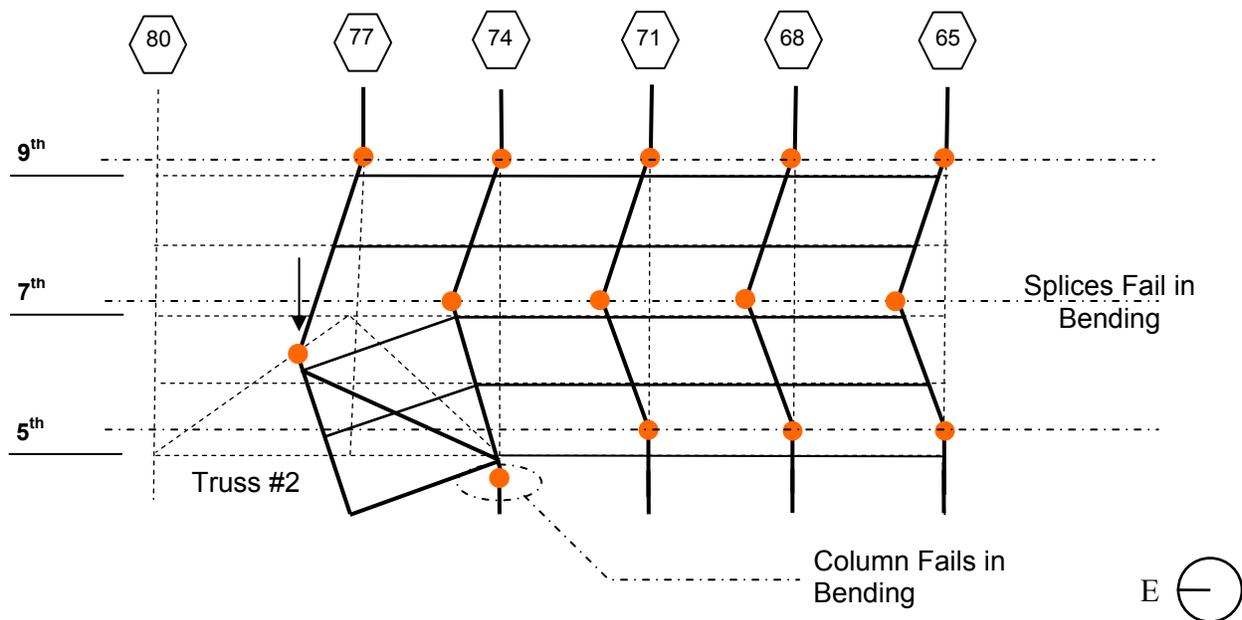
Horizontal progression mechanism for truss #2 failure.
